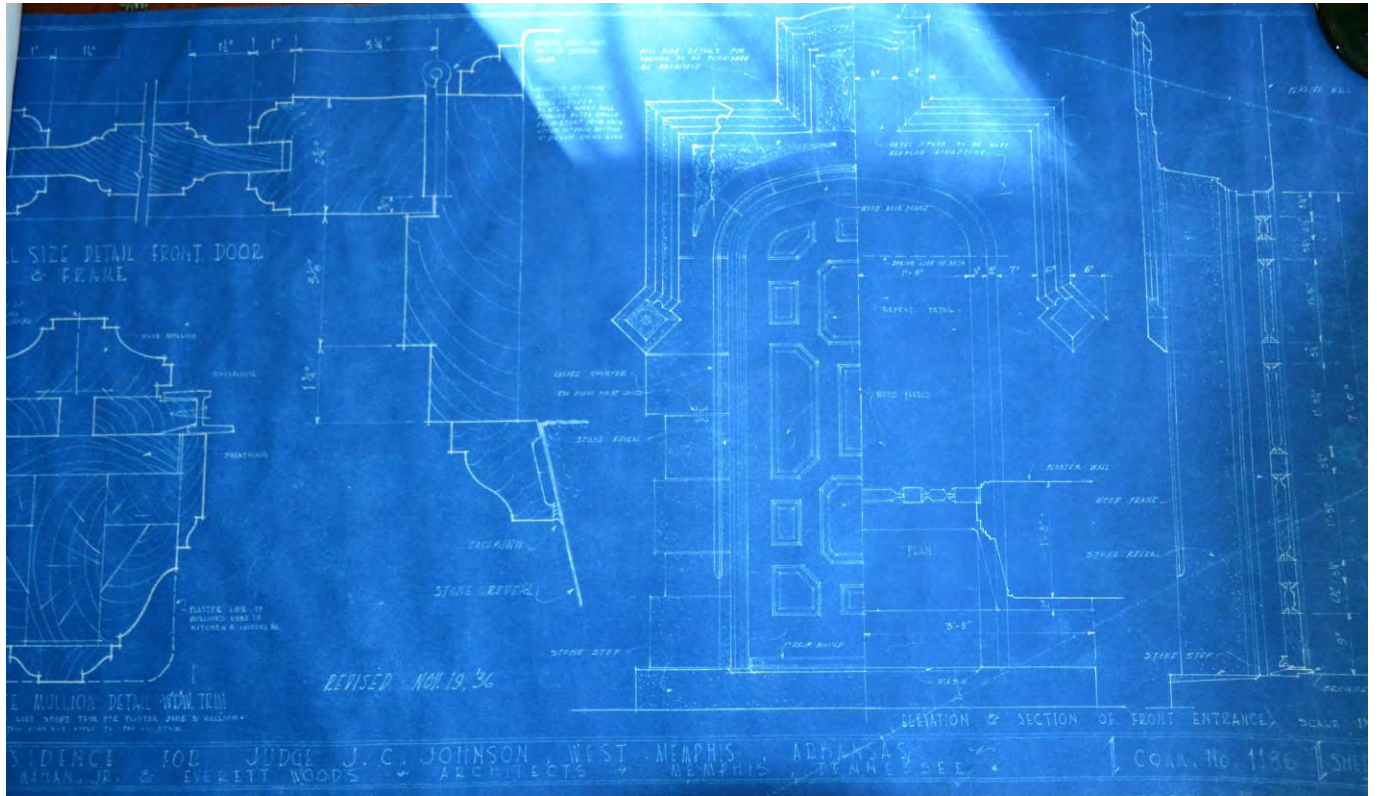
Door Details Drawing, Johnson-Portis House, 1936.
